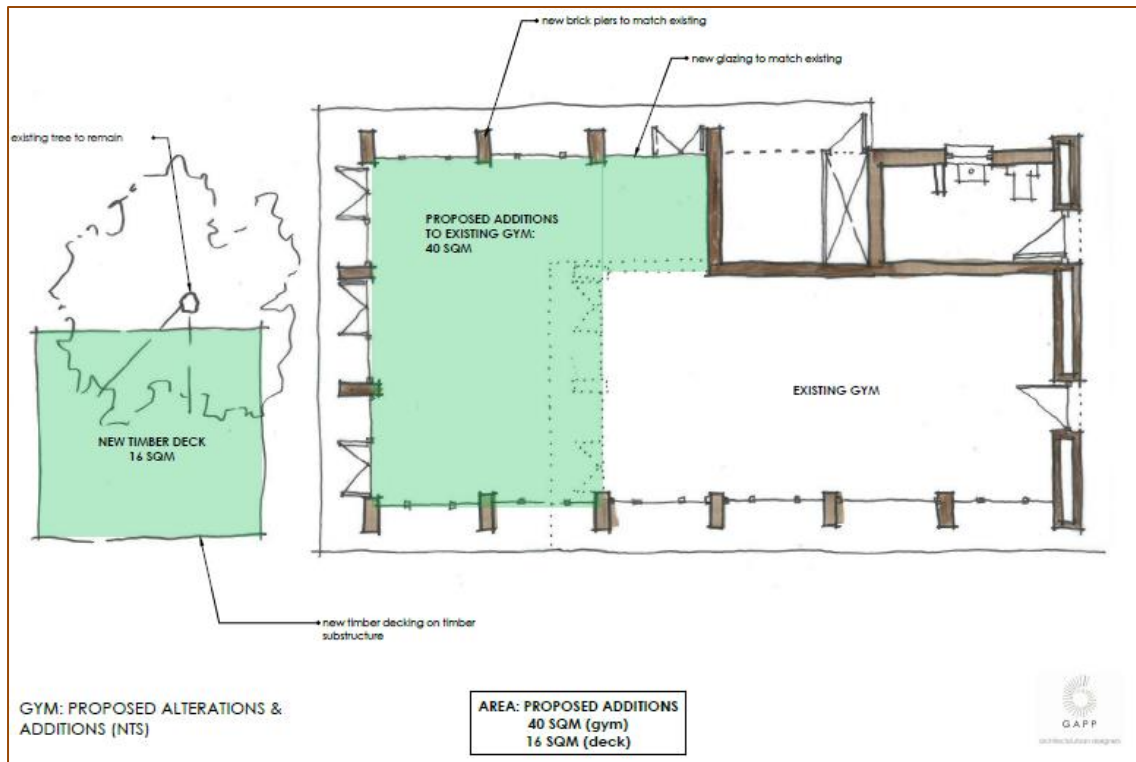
Plan view of proposed extension to existing gym and new yoga platform.
